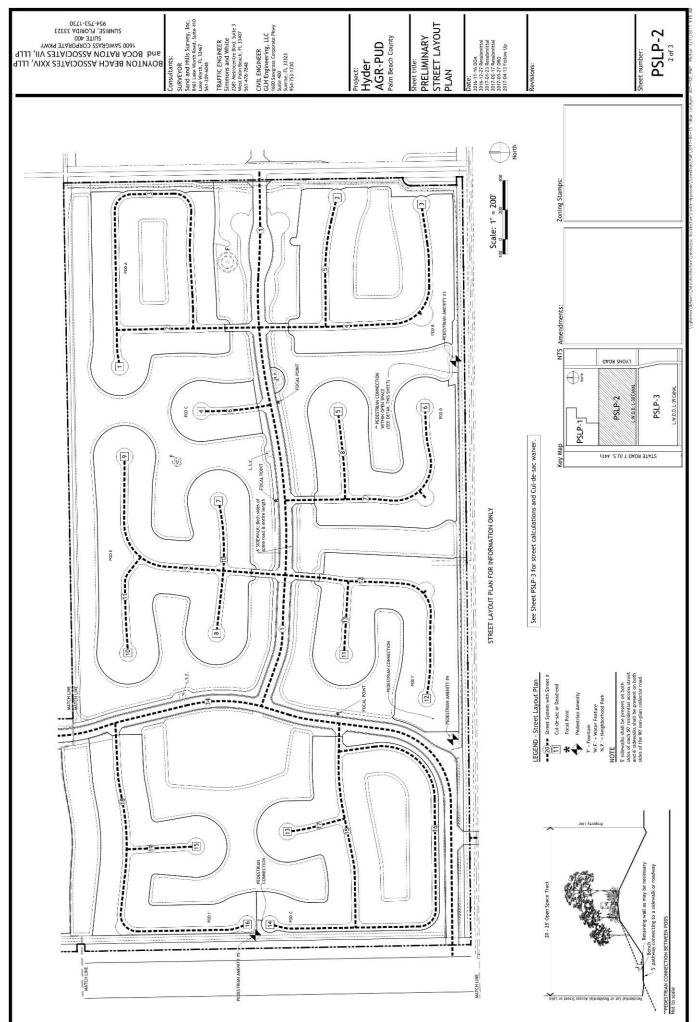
Preliminary Street Layout Plan dated April 13, 2017 (Sheet 2 of 3)
